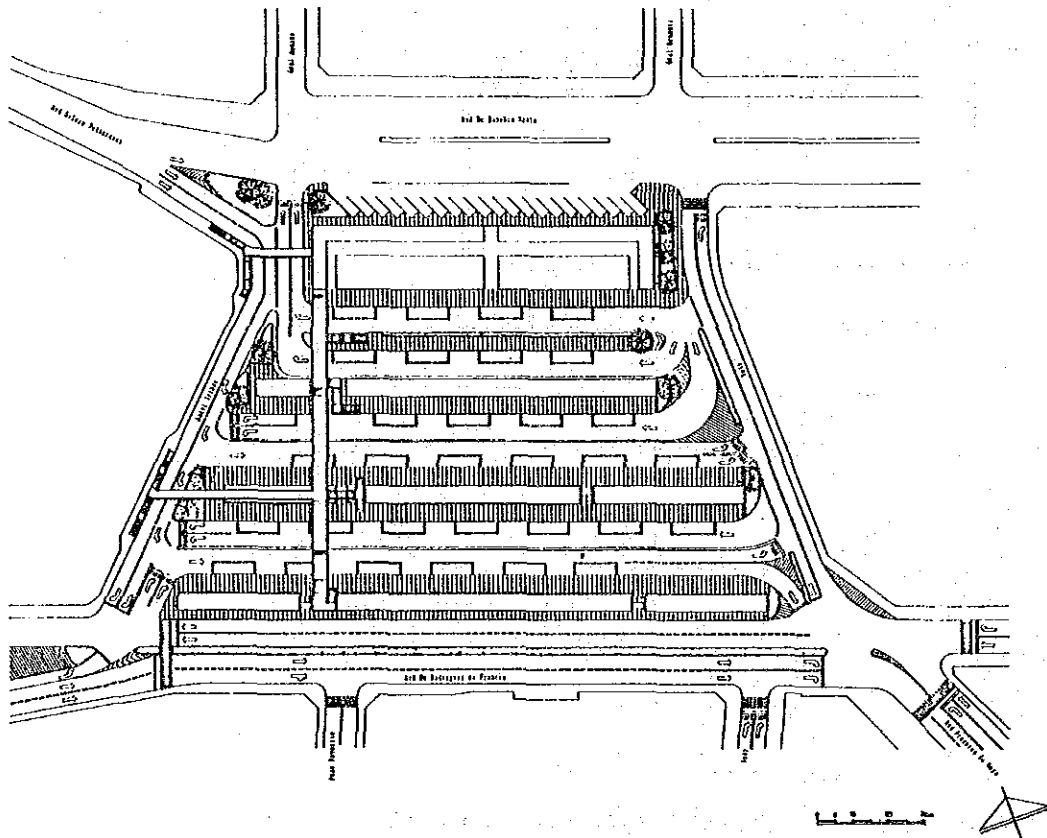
BUS TERMINAL PLAN (ALTERNATIVE NO. 2)
